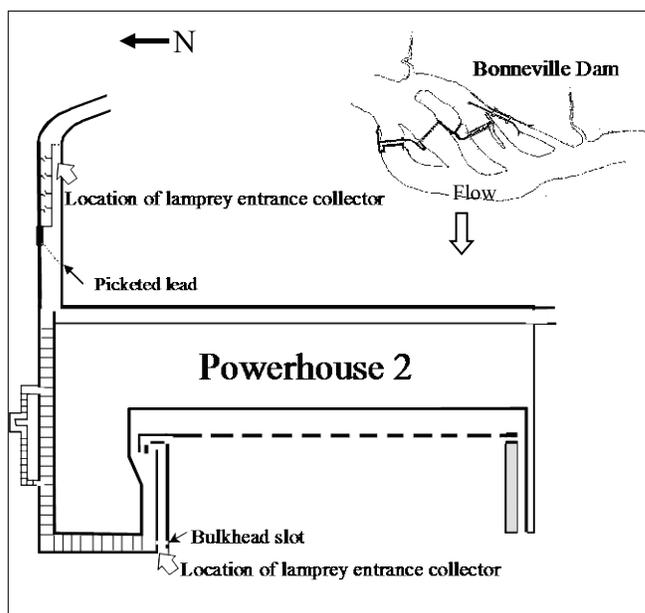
Locations of lamprey structures at the Washington Shore fishway.
